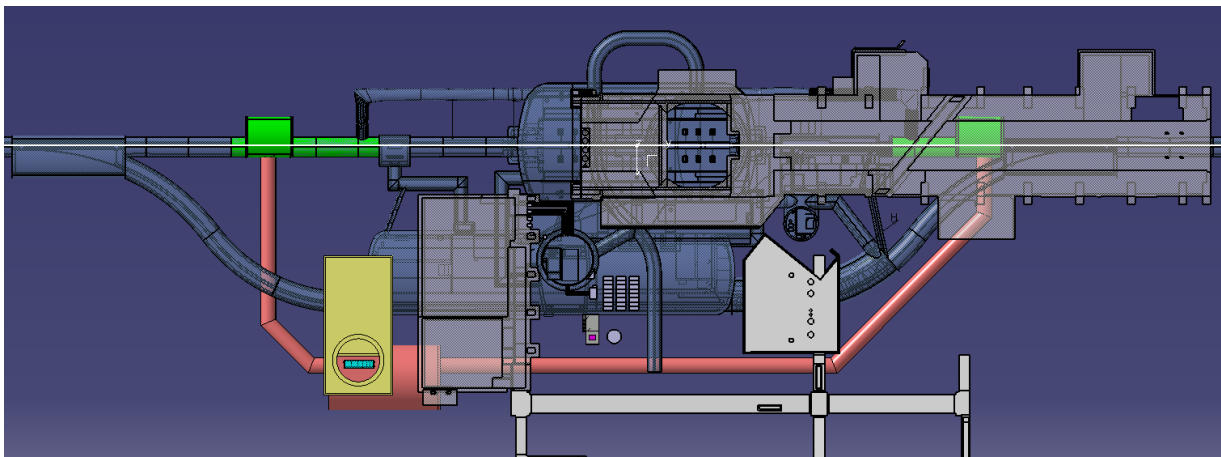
Possible option for underground work at P5 including links to the LHC tunnel. This solution has an independent shaft for access to the surface. New structures are in light red and yellow, and zones of the LHC tunnel to be impacted by construction of the new structures are in green.
